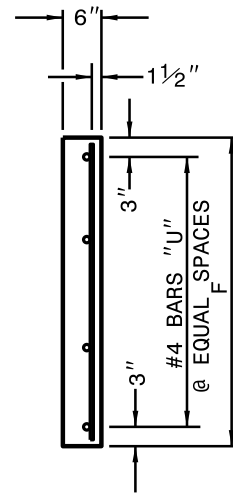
DETAIL SHOWING METHOD OF RISER CONSTRUCTION
